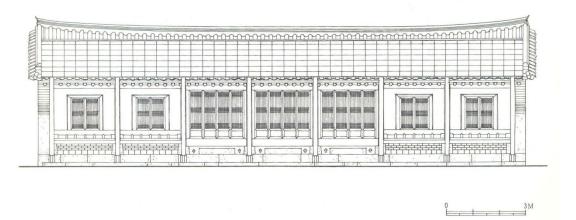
Seonhyangjae Elevation (N. Zu 2003)
